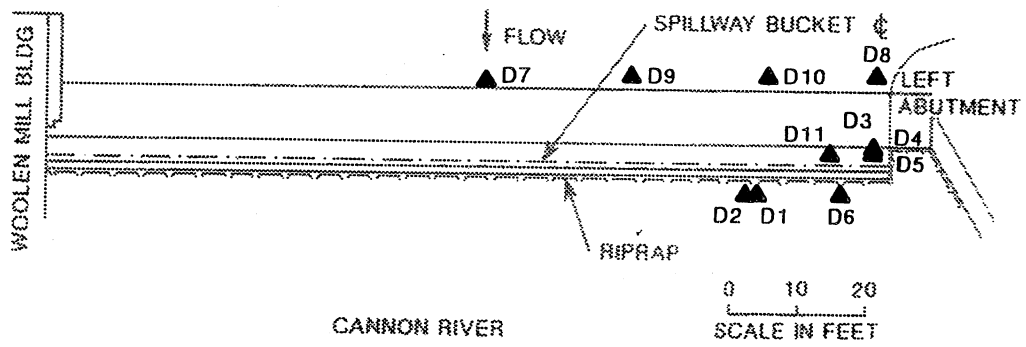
Plan view of February 28, 1986, sampling locations.
